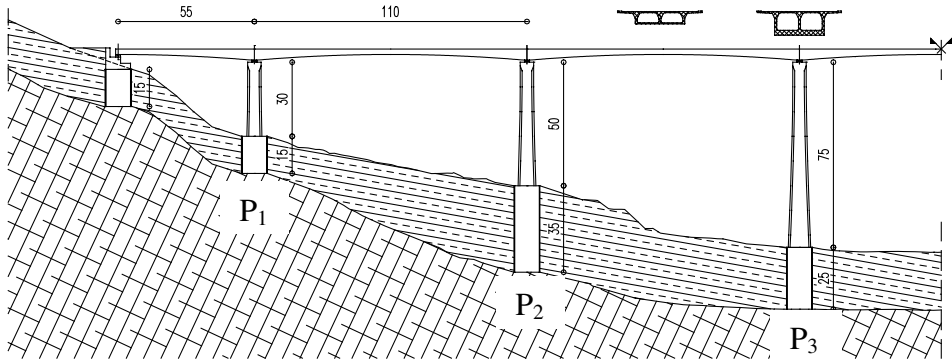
Longitudinal view of the viaduct used to study soil-foundation-structure interaction and longitudinal section of the foundation subsoil.
